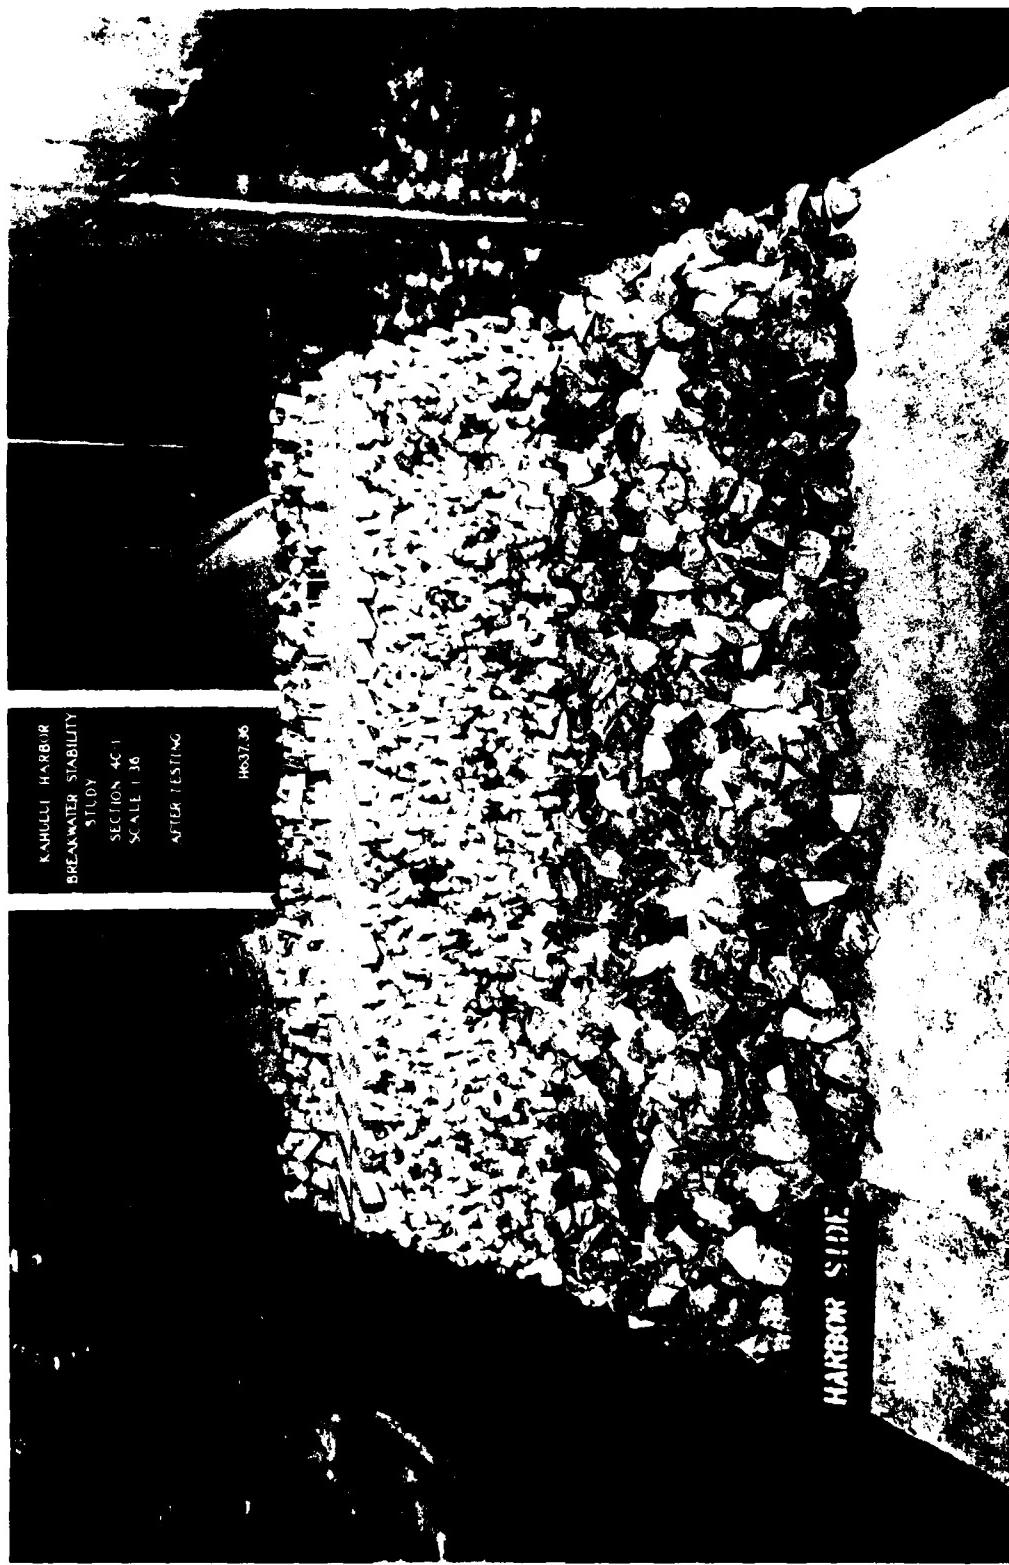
Harbor-side view of Plan 1F-1 after testing, 1st test
